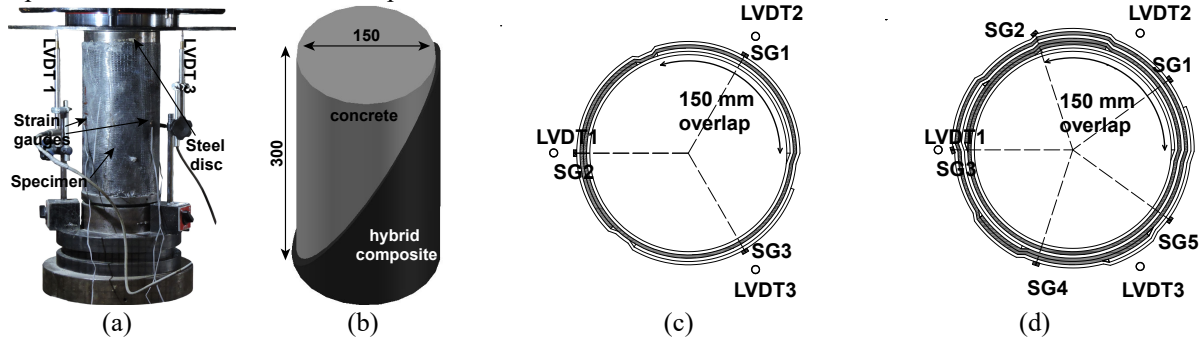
Axial compressive test: (a) illustration of the test; (b) geometry of specimen (dimensions in mm); (c) layers position, LVDT and strain gauge arrangement for confining systems with 3 layers and (d) layers position, LVDT and strain gauge arrangement for confining systems with 5 layers.
